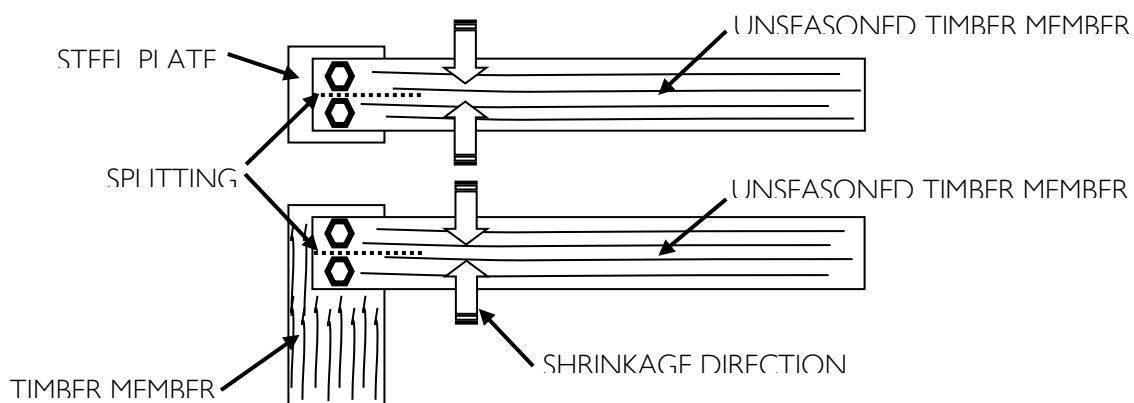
Poor Detailing: Timber shrinkage restrained by steel plate and longitudinal grain
